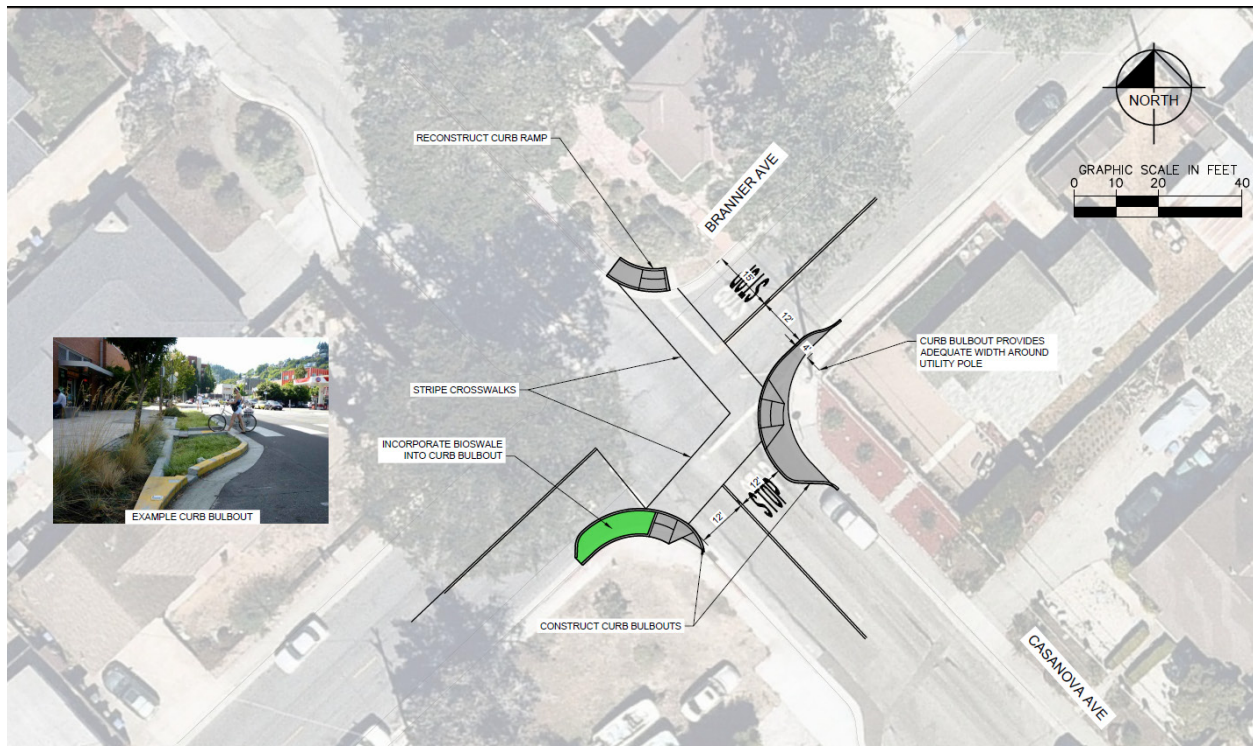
Casanova Avenue and Branner Avenue Curb Extension/ Bulbouts
